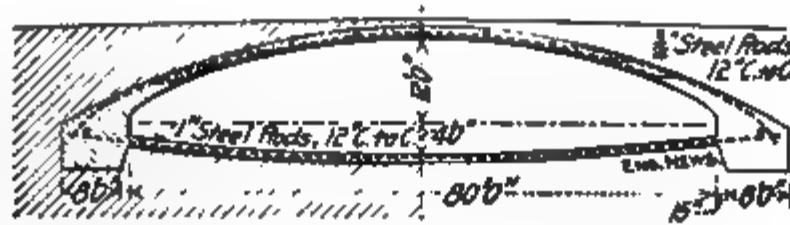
CLIFTY CREEK REINFORCED CONCRETE ARCH BRIDGE.
